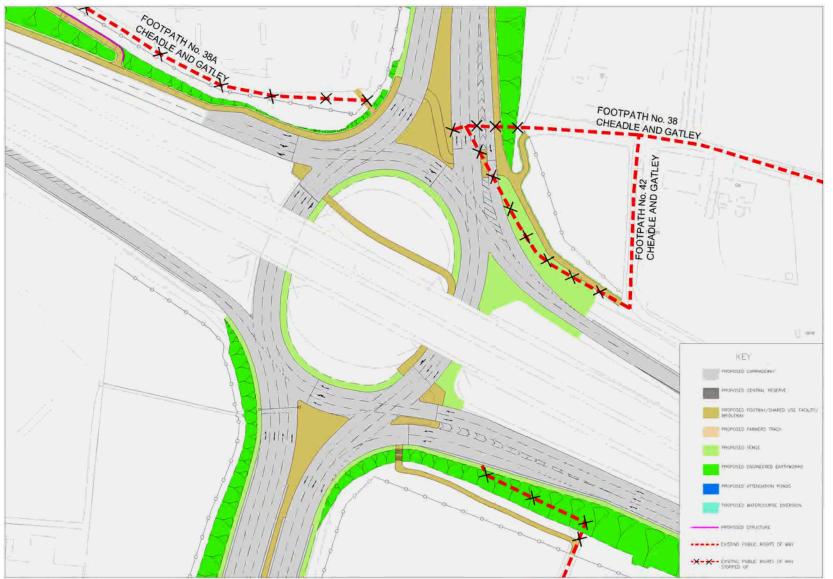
Proposed Highway Route: Cheadle (A34/ B5094 Stanley Road Junction)
